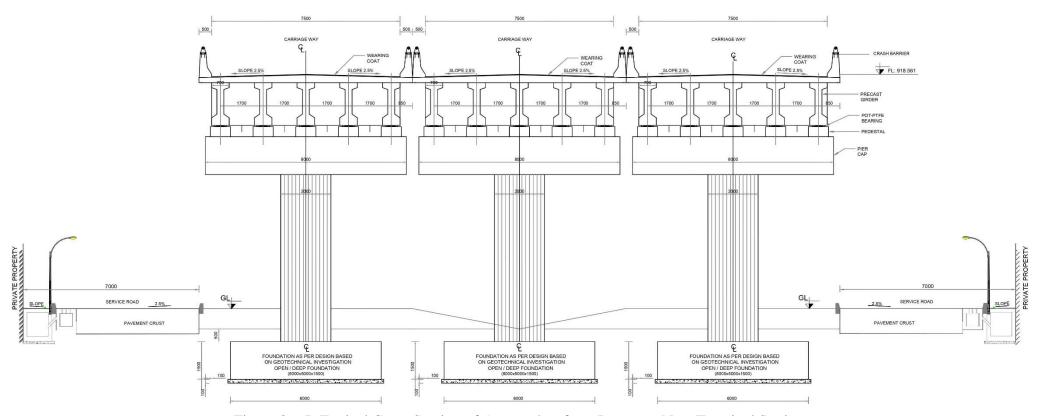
B Typical Cross Section of Approaches from Rotary to New Terminal Station
